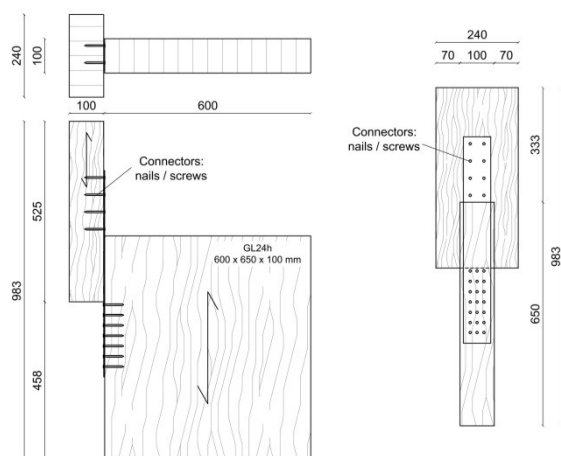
geometrical properties of specimens for steel-to-timber connection tests
